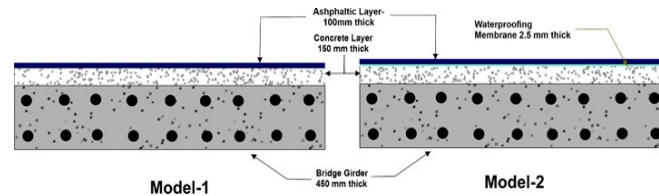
Cross Section of bridge deck with and without waterproofing membrane
